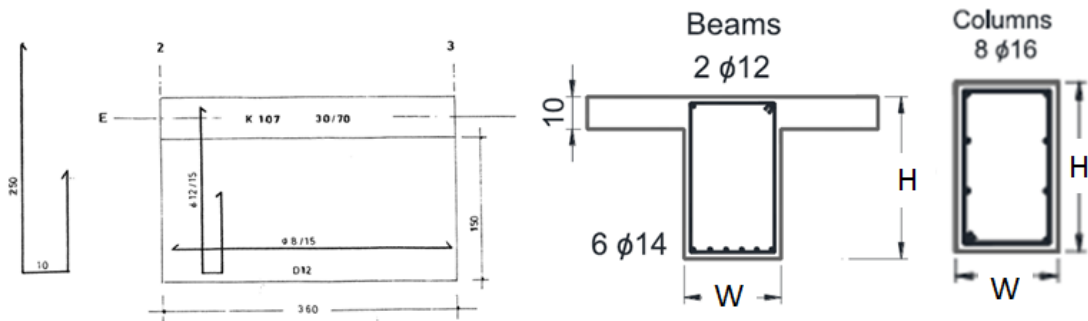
Cross-section drawings of Gedikbulak building's members.
